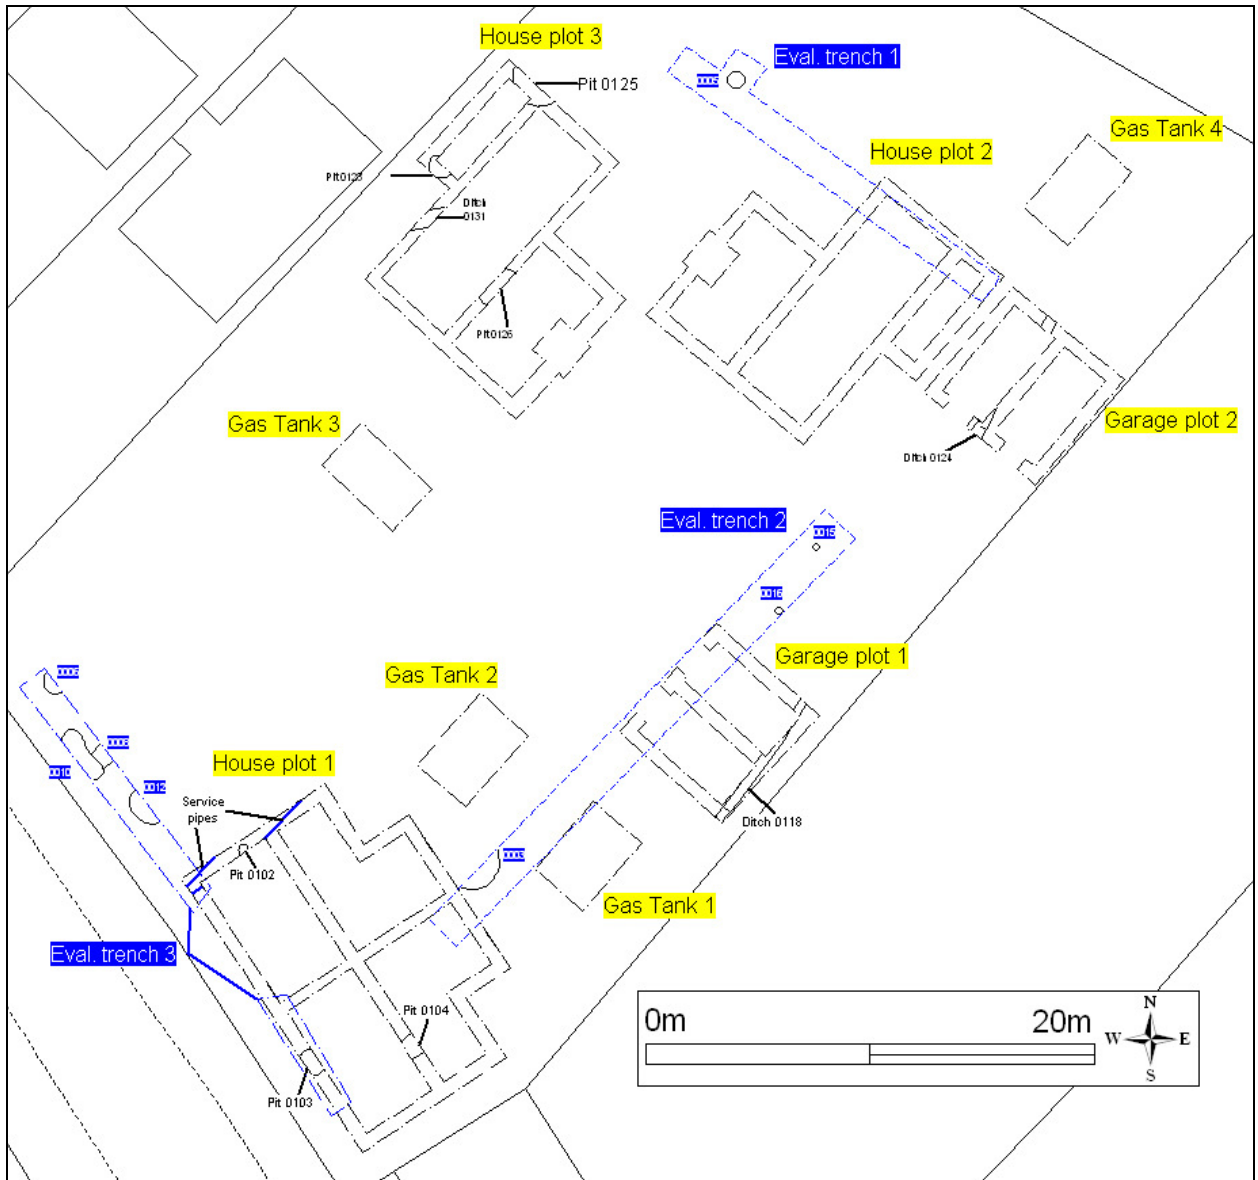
Trench plan with previous evaluation trenches overlaid in blue.
